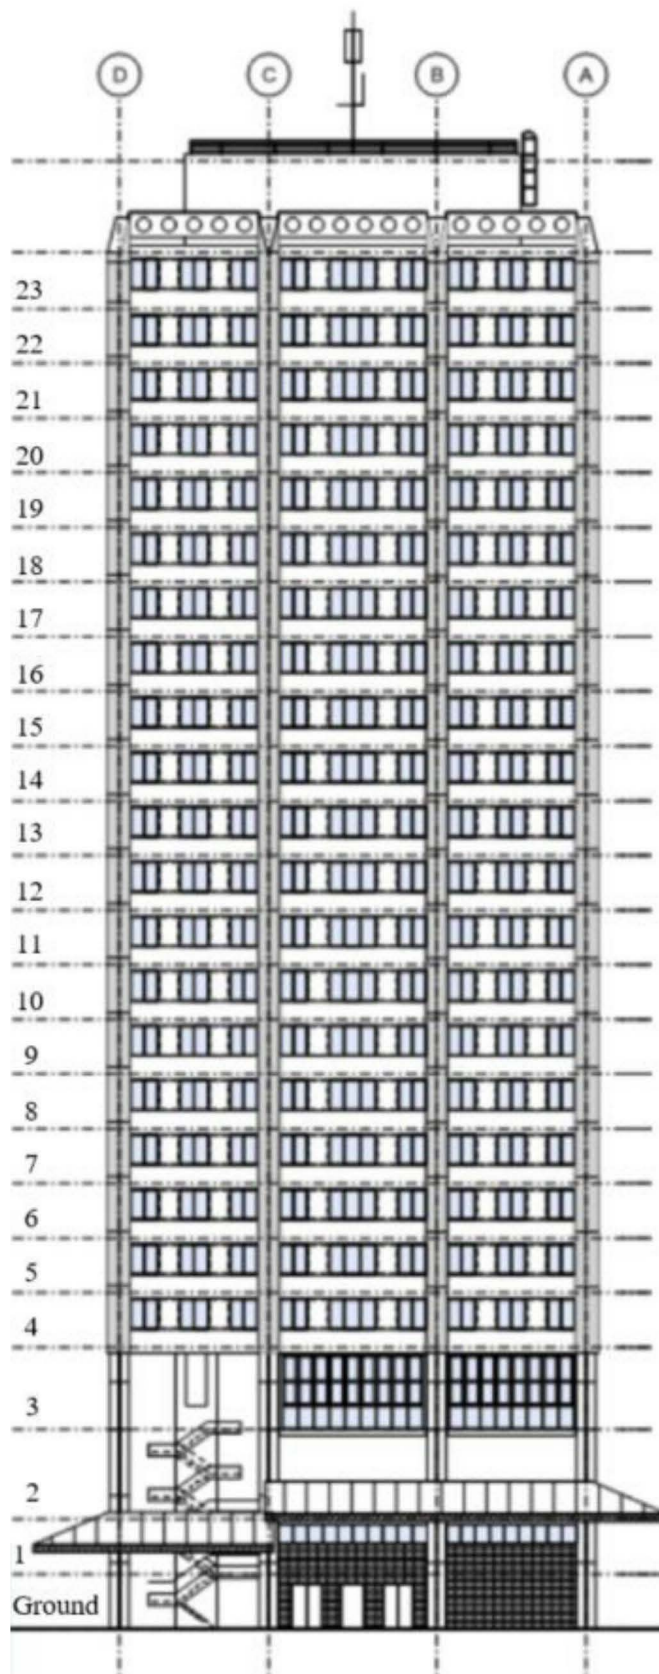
Original construction - East building elevation showing external stair from Level 3 to Ground Level (SEA00001579)
